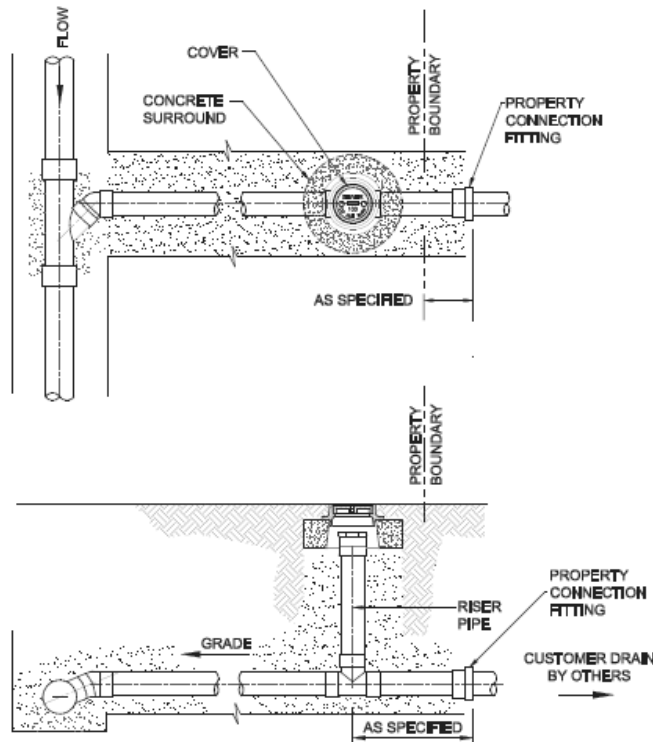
TYPICAL RAISED INSPECTION OPENING INTERFACE METHOD
